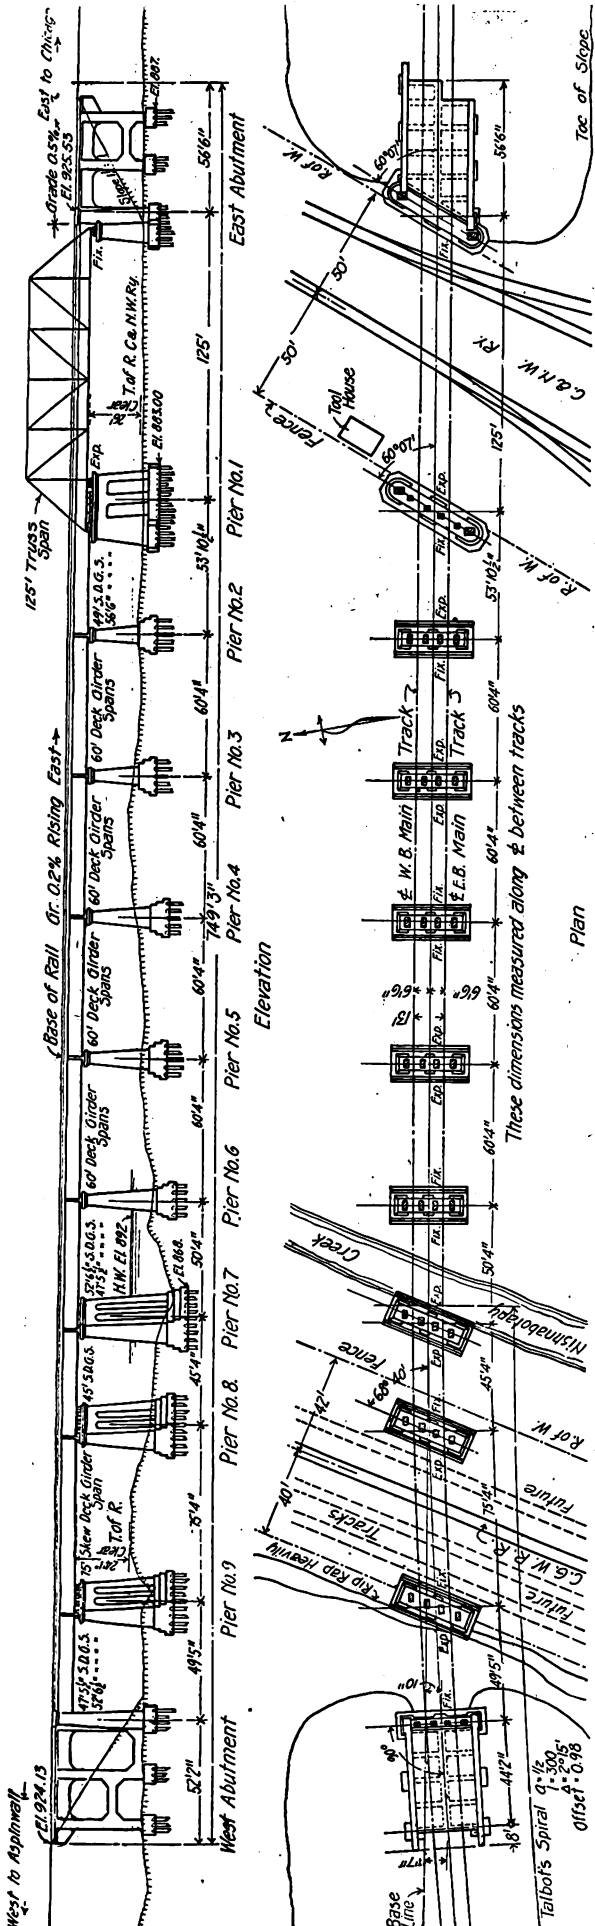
General Elevation and Plan of Manning Viaduct, C., M. & St. P. Ry.
